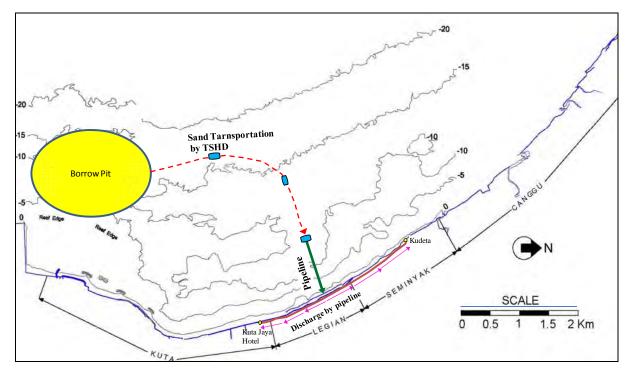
Construction Image for Sand Transportation from Borrow Site
